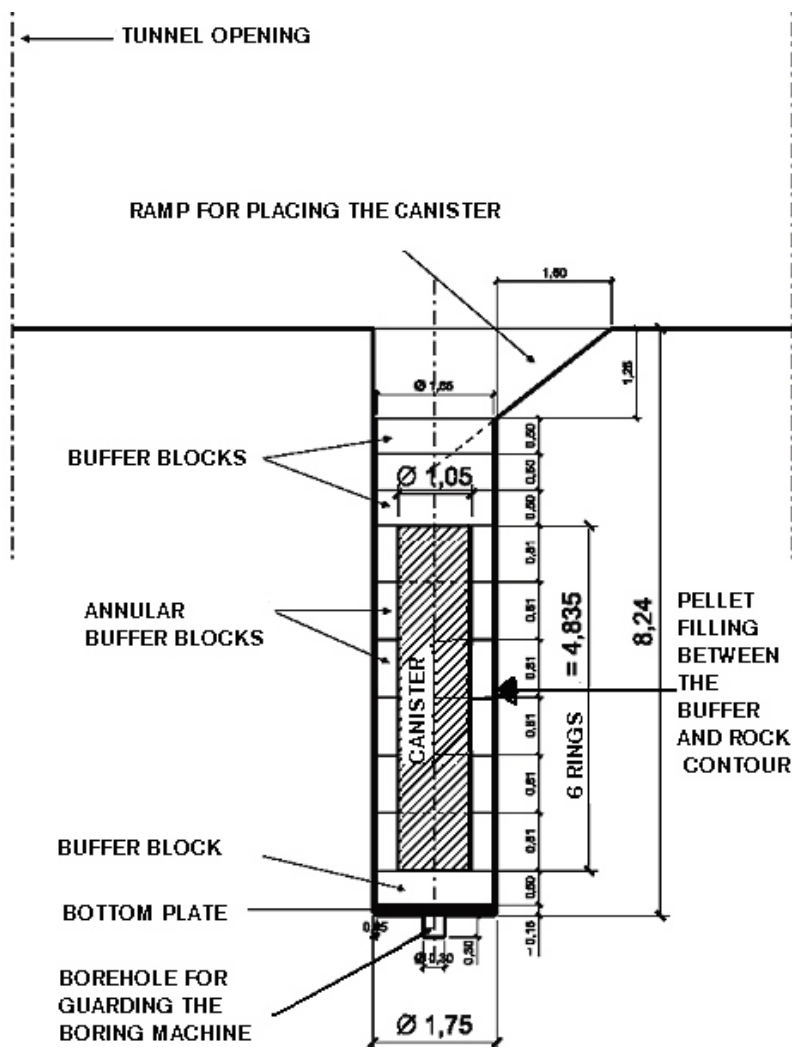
Section of deposition hole. The pellet fillings around and above the buffer blocks are not shown.
